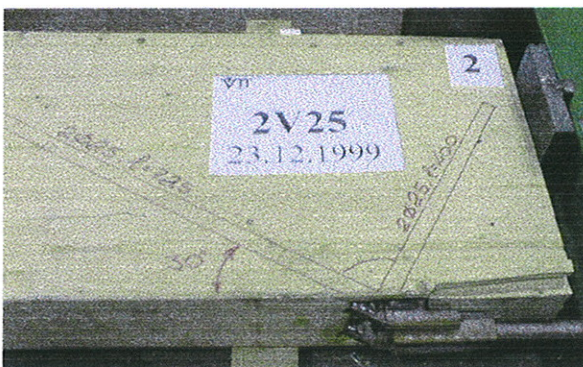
Test specimen 2V25 after failure at 734 kN and cut open.
